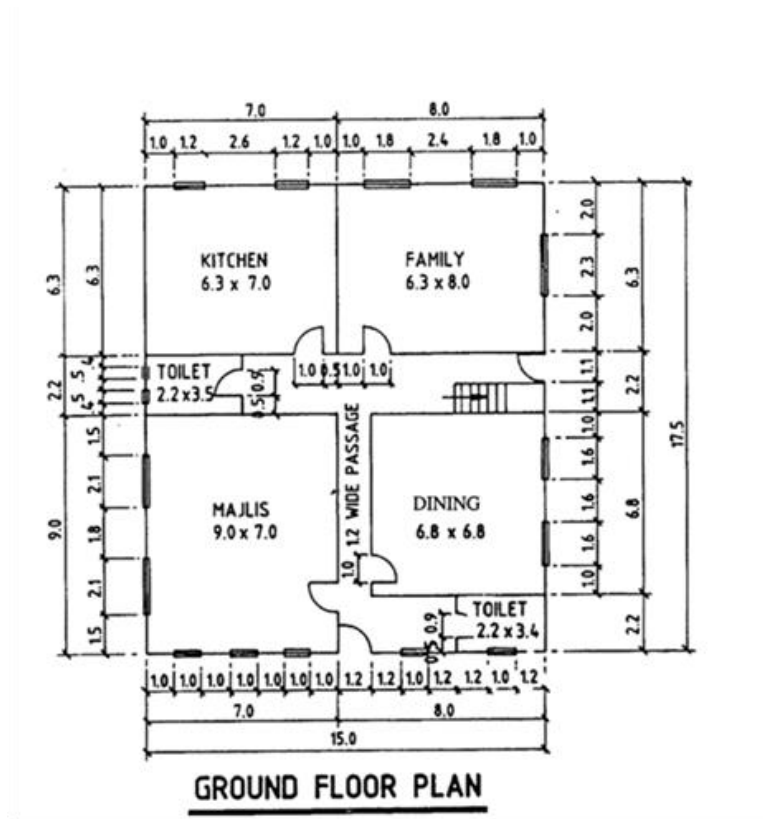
Typical house ground floor plan (Ahmad 2004).
